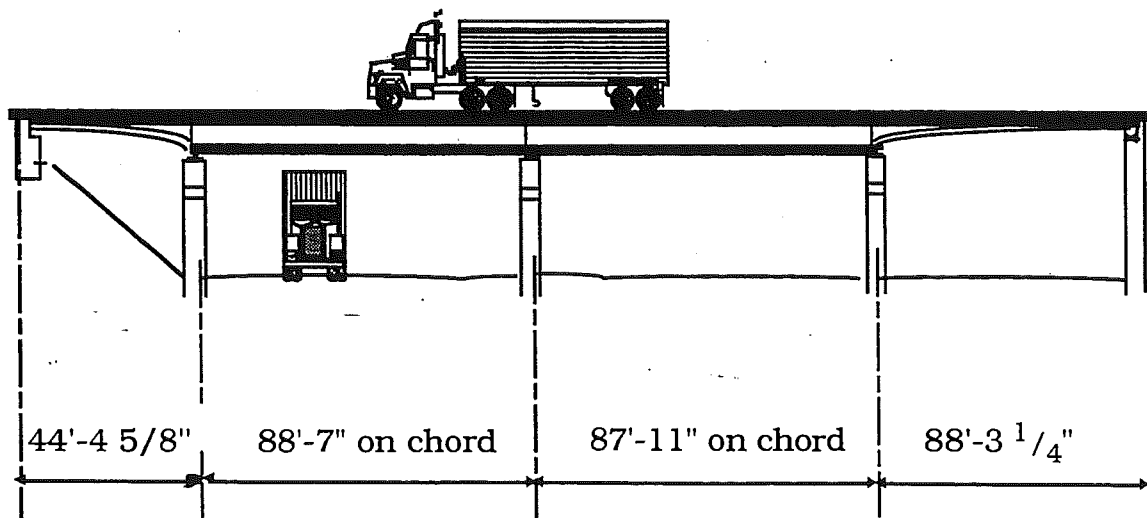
Bridge I94/I75, I-94 Westbound over I-75. Side Elevation.
